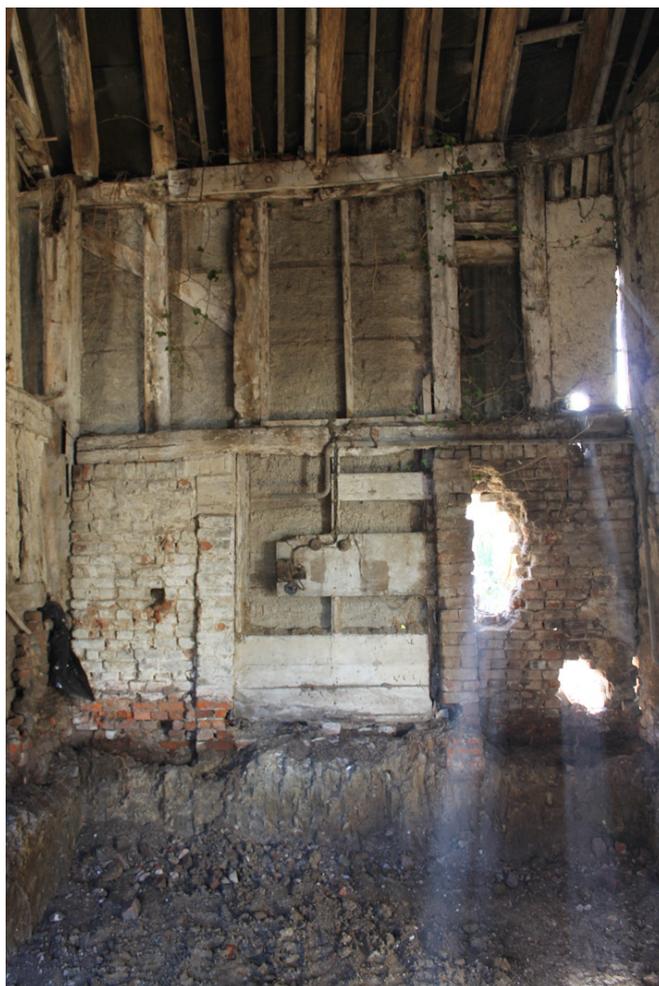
North side of bay one, showing binding beam for first floor jointed to storey post. Photo taken facing north-west.
